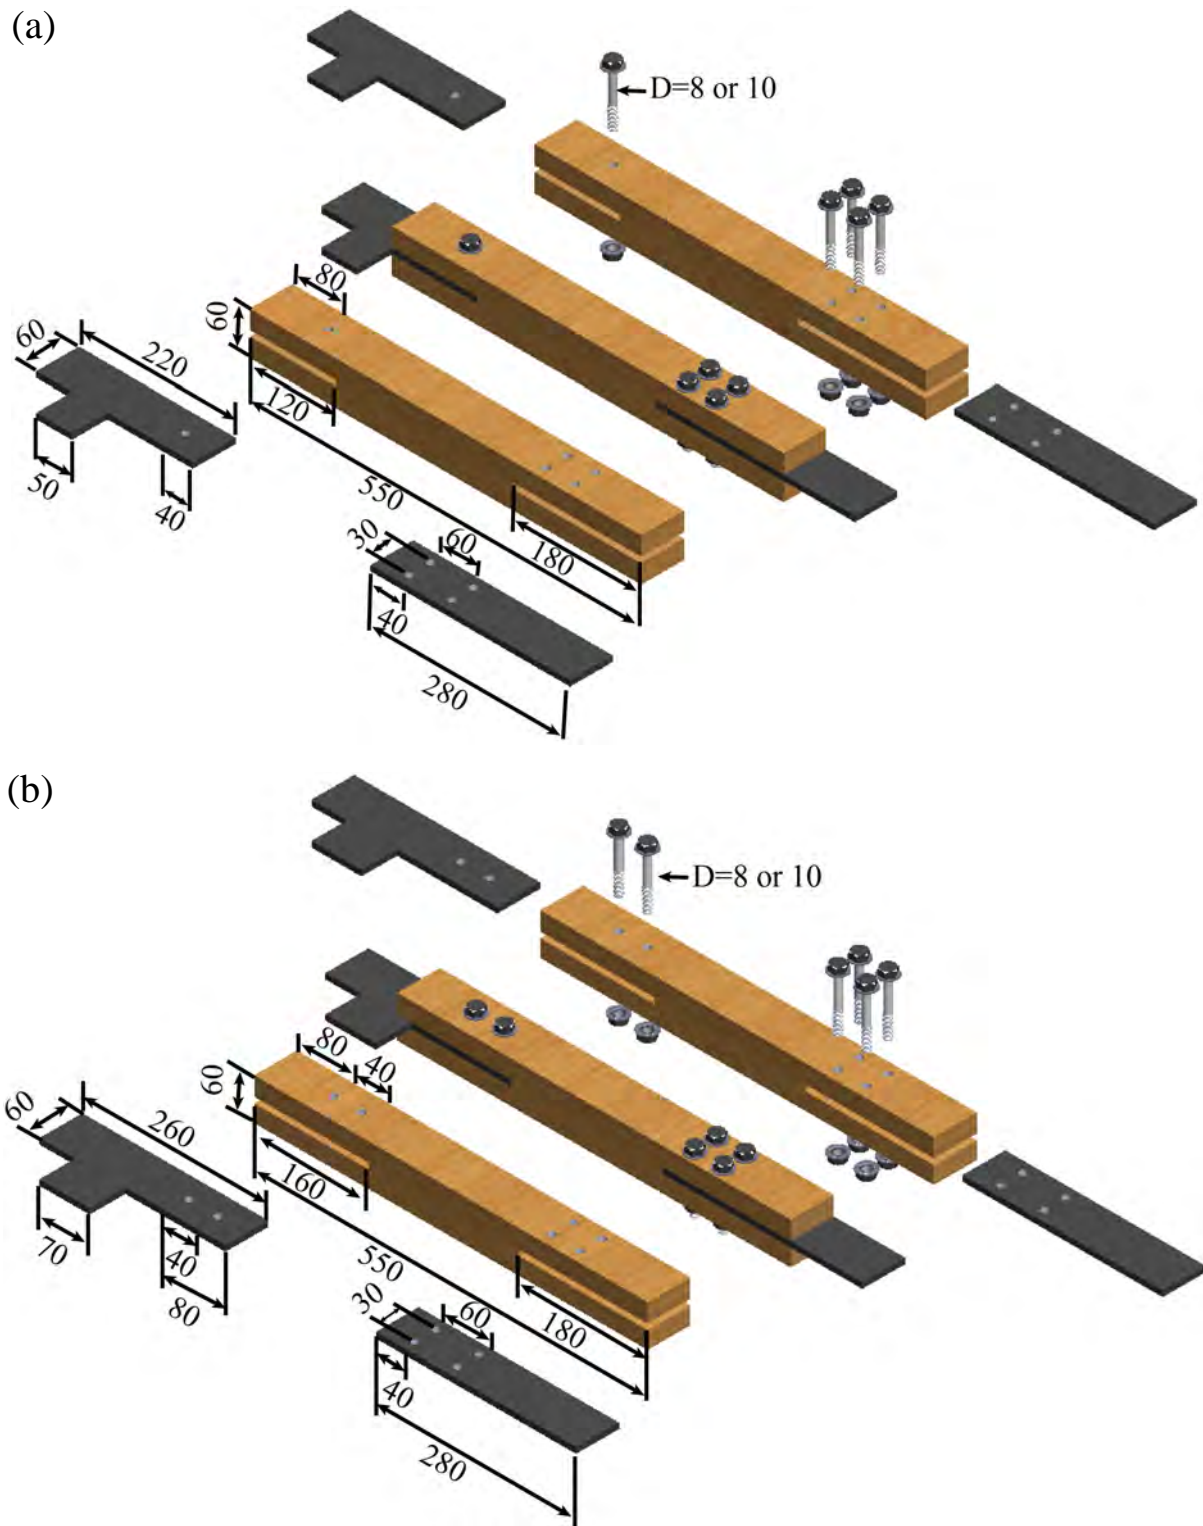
Configurations of single-bolted specimen (a) and double-bolted specimen (b). For each case, different diameters of bolts (8 mm or 10 mm) are considered. The specimens have two dissimilar slotted-in steel plates at each end. The tested side, where connection damage is expected, has fewer bolts. The other side has a higher capacity and always uses four bolts. The connection length is balanced between avoiding interaction between the two end connections and the limited space in the testing apparatus.
